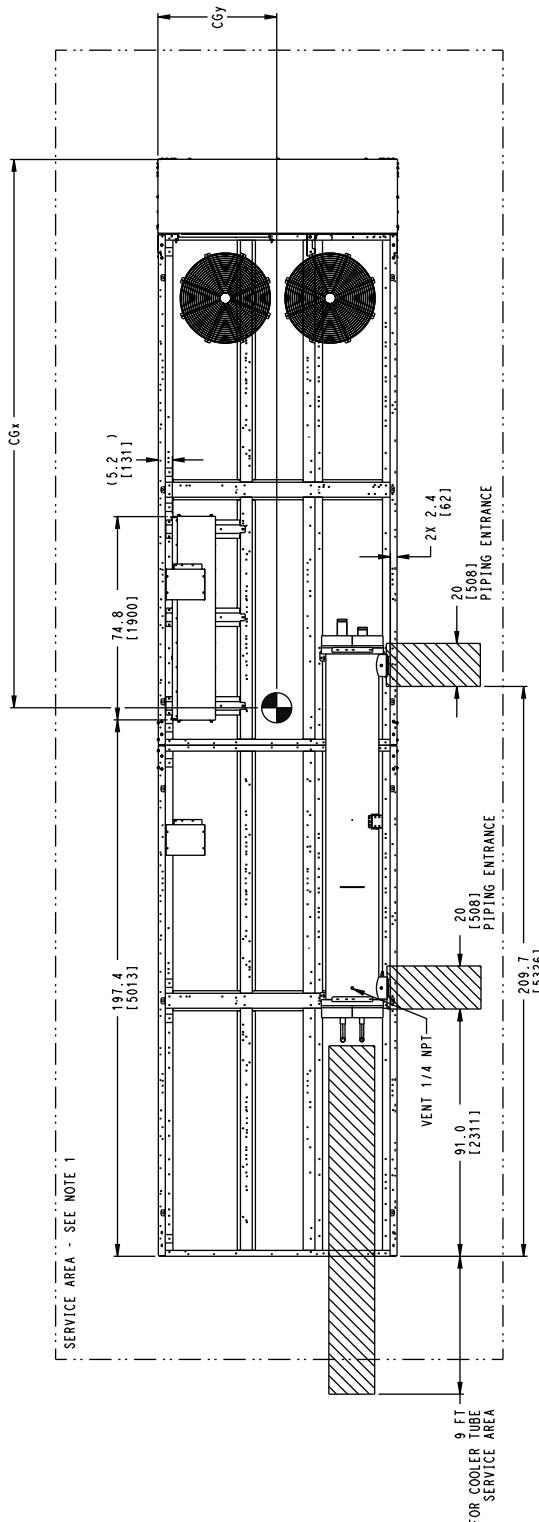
30XA262,282 Air-Cooled Liquid Chiller Dimensions (DX Cooler)
